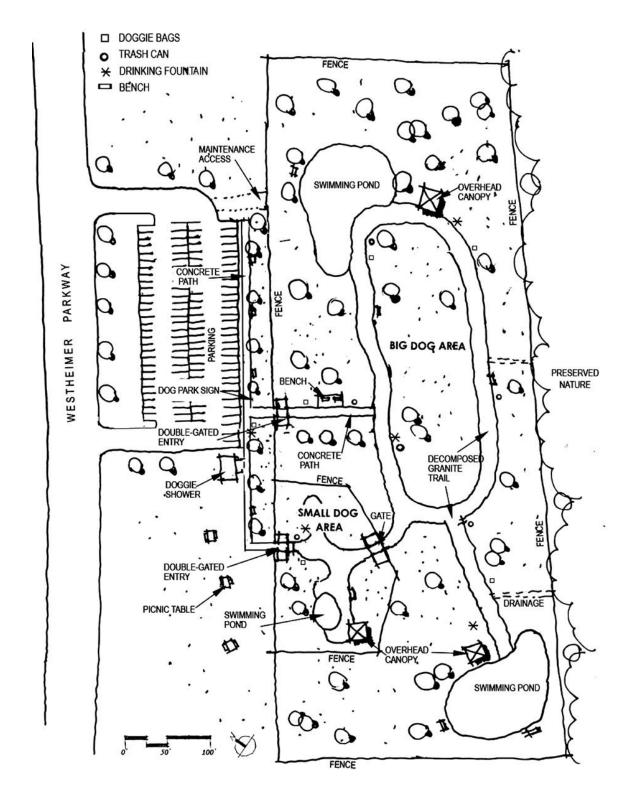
Millie Bush Dog Park plan, (Lee, Shepley, and Huang 2009)
